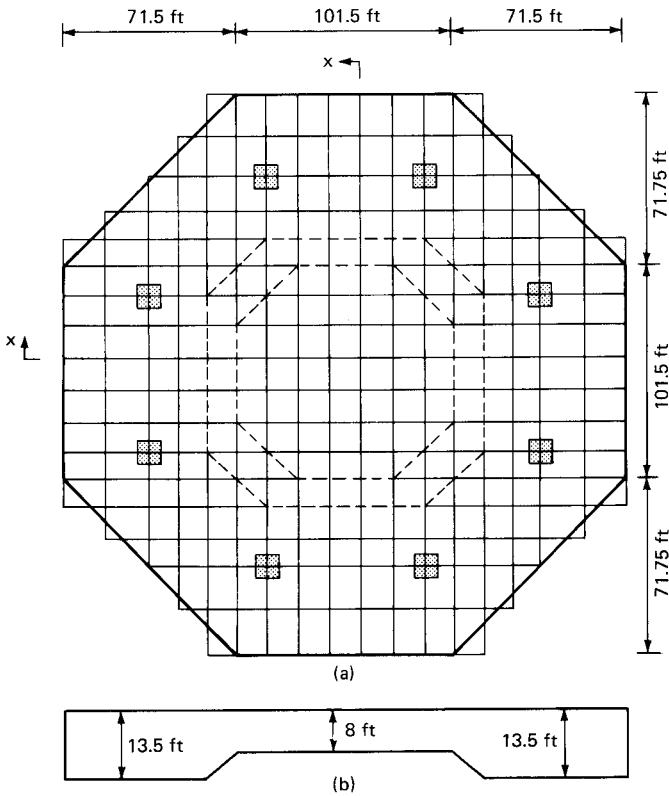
Foundation mat for a proposed 85-story office building. (a) Finite element idealization; (b) cross section $x-x$ through mat.
